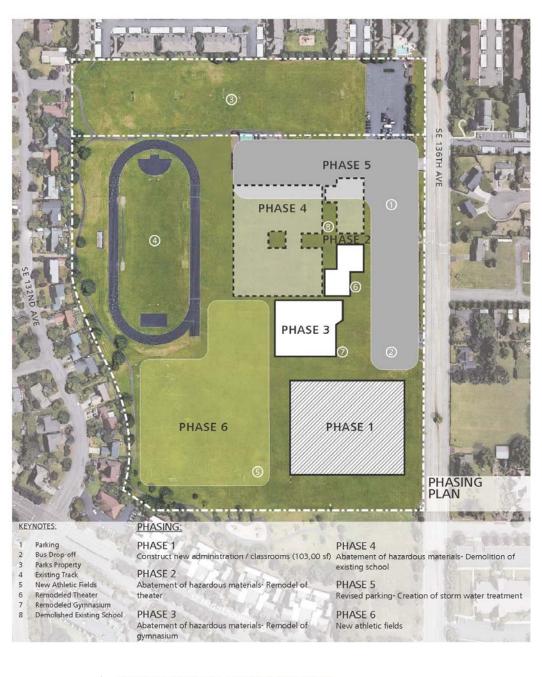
PHASING PLAN / PROPOSED DEVELOPMENT
